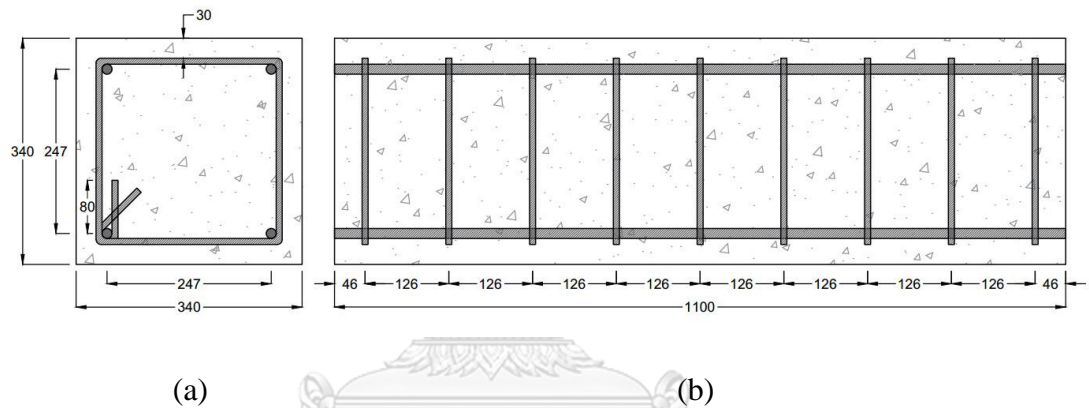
Reinforcement details of RC-126 column; (a) cross-section; and (b) longitudinal section (dimensions in mm).
